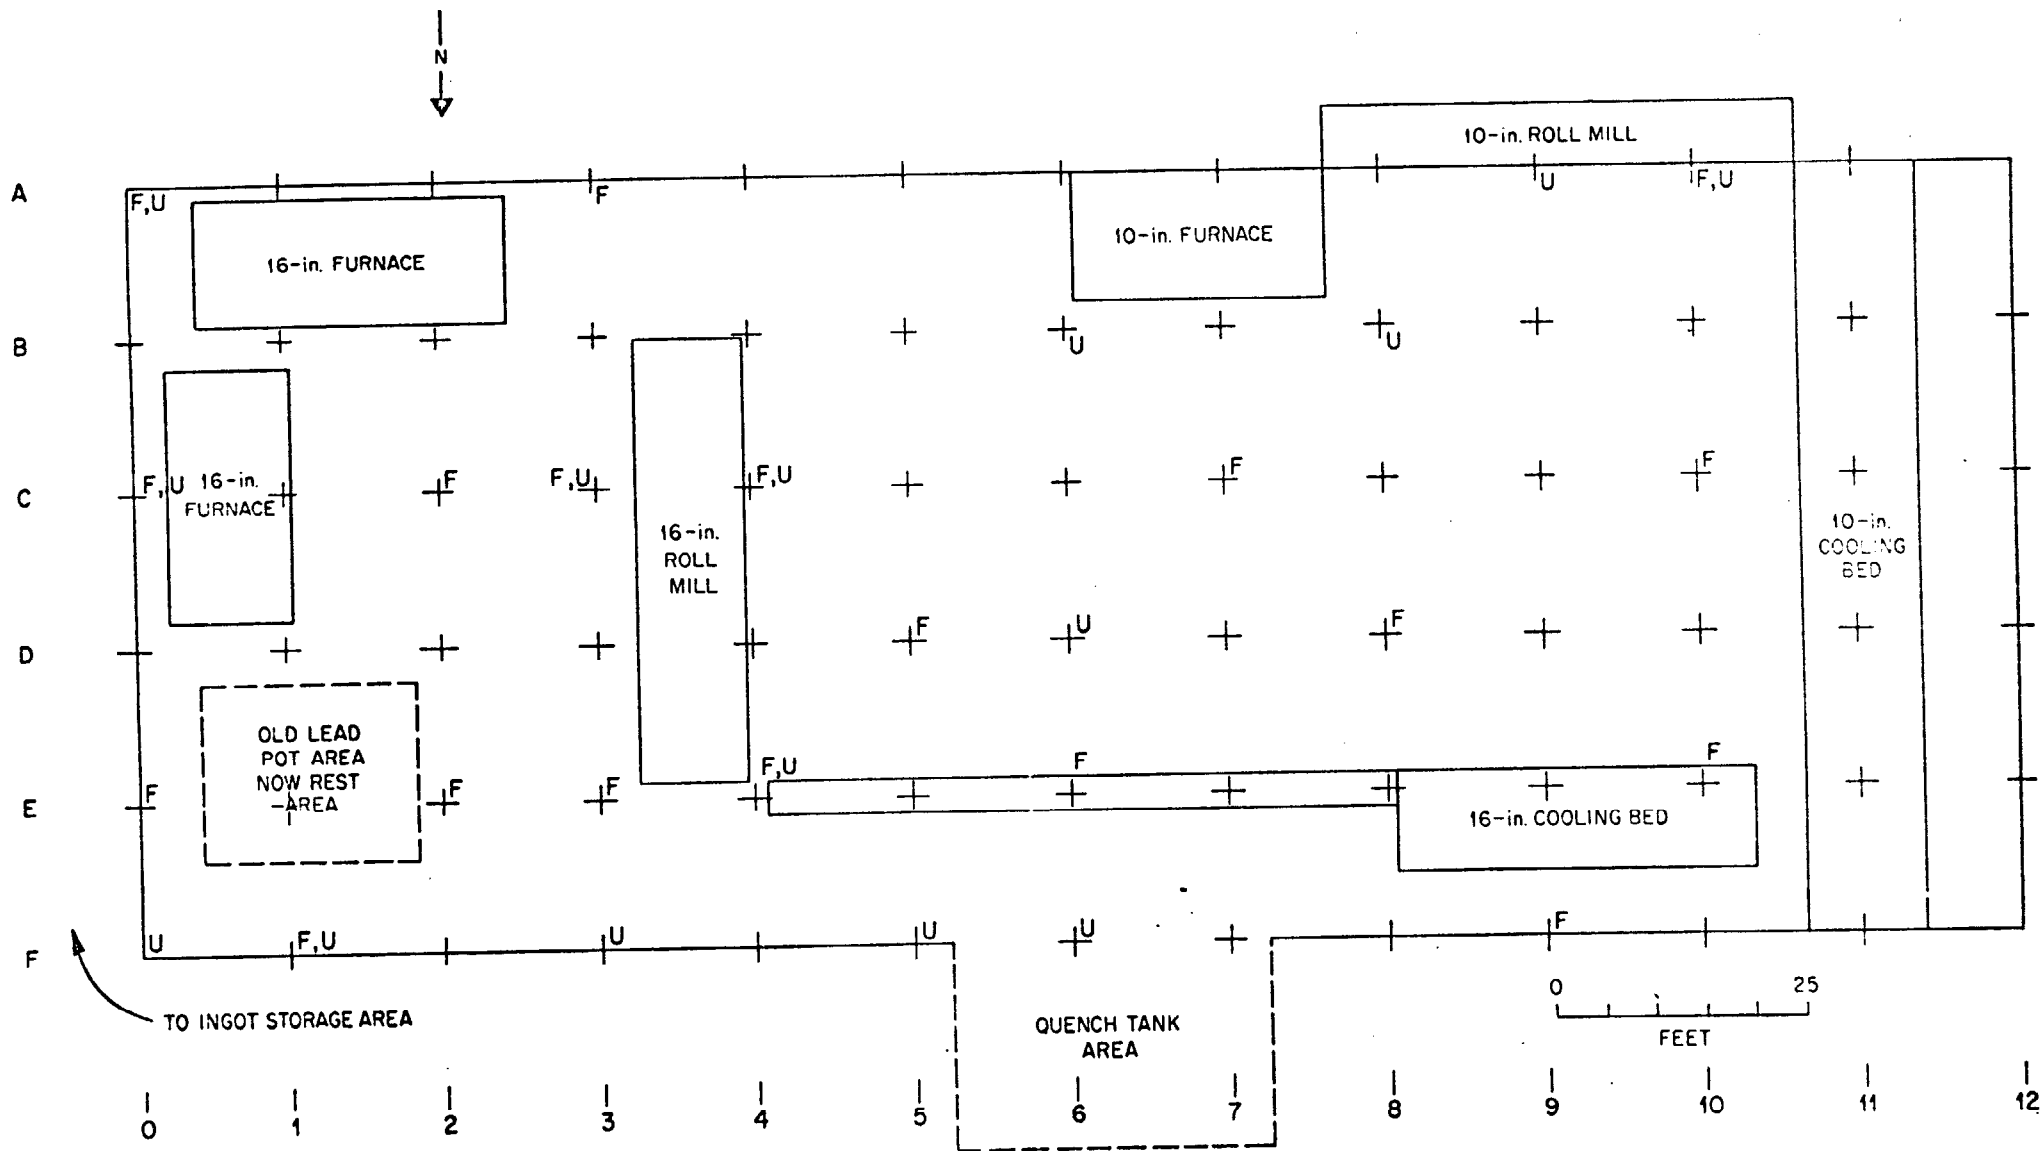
Locations at which Smear Samples Were Taken in Rolling Mill Area.
